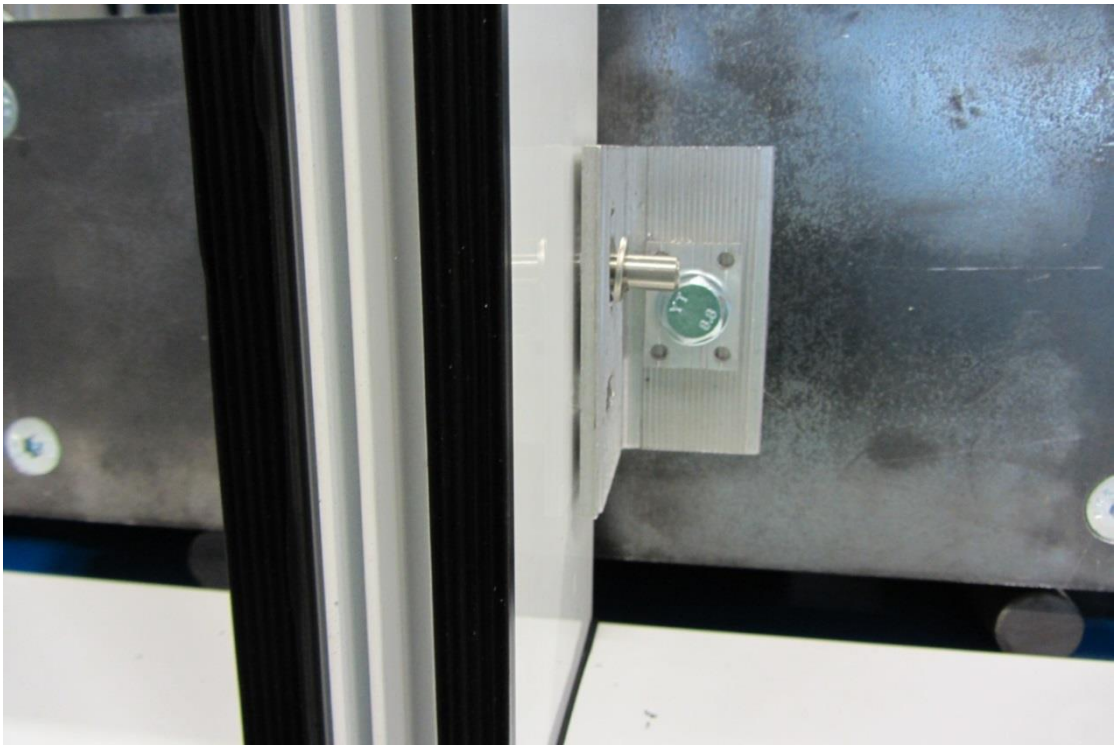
deformed anchor to the structure in the middle (after dismounting)
